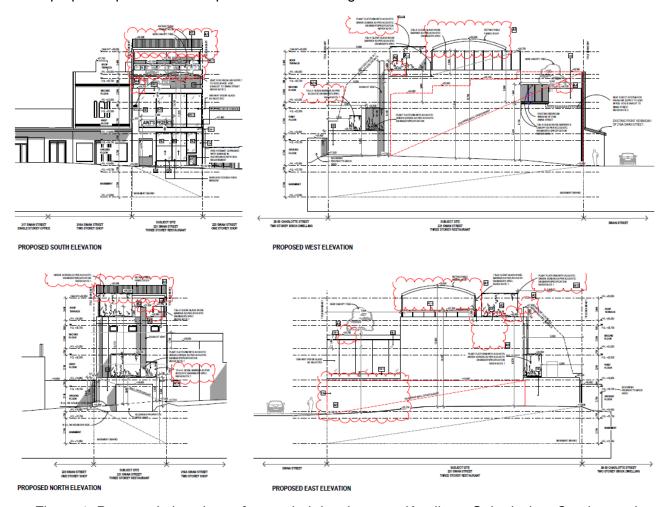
Proposed elevations of amended development (Applicant Submission, October and November 2020)
